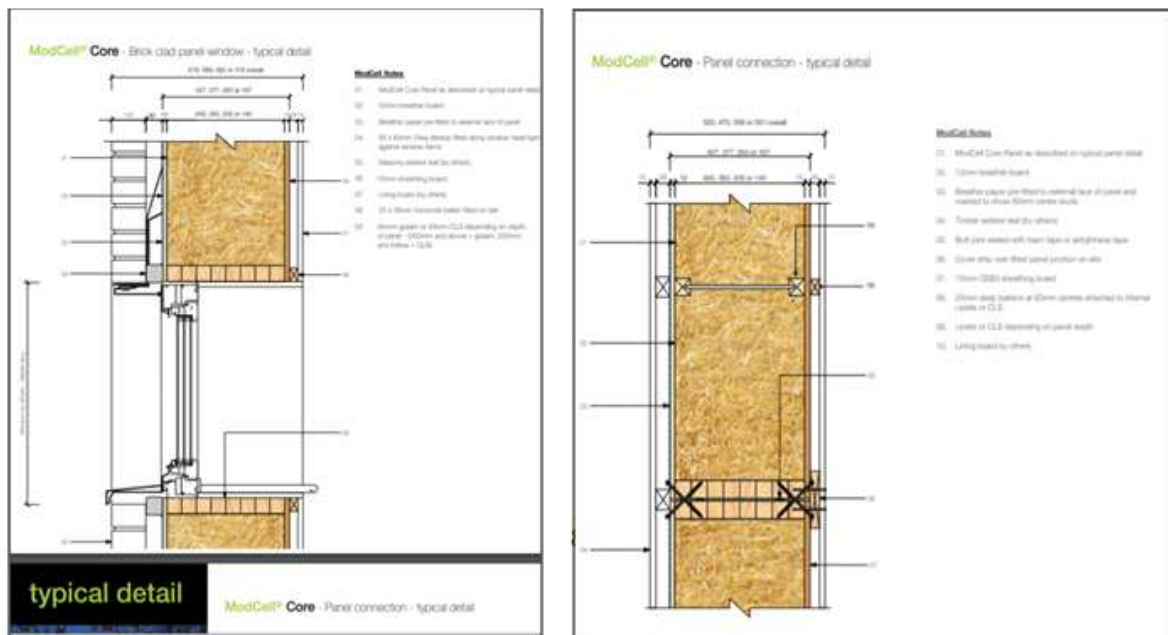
Typical Detail of Wall and Window Fixing Detail.
